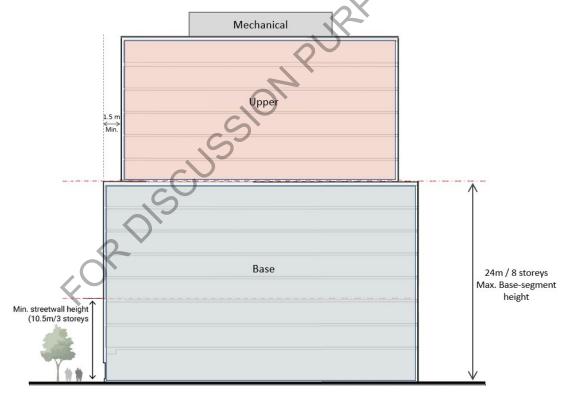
Mid-range high-rise building type (9-15 storeys).
